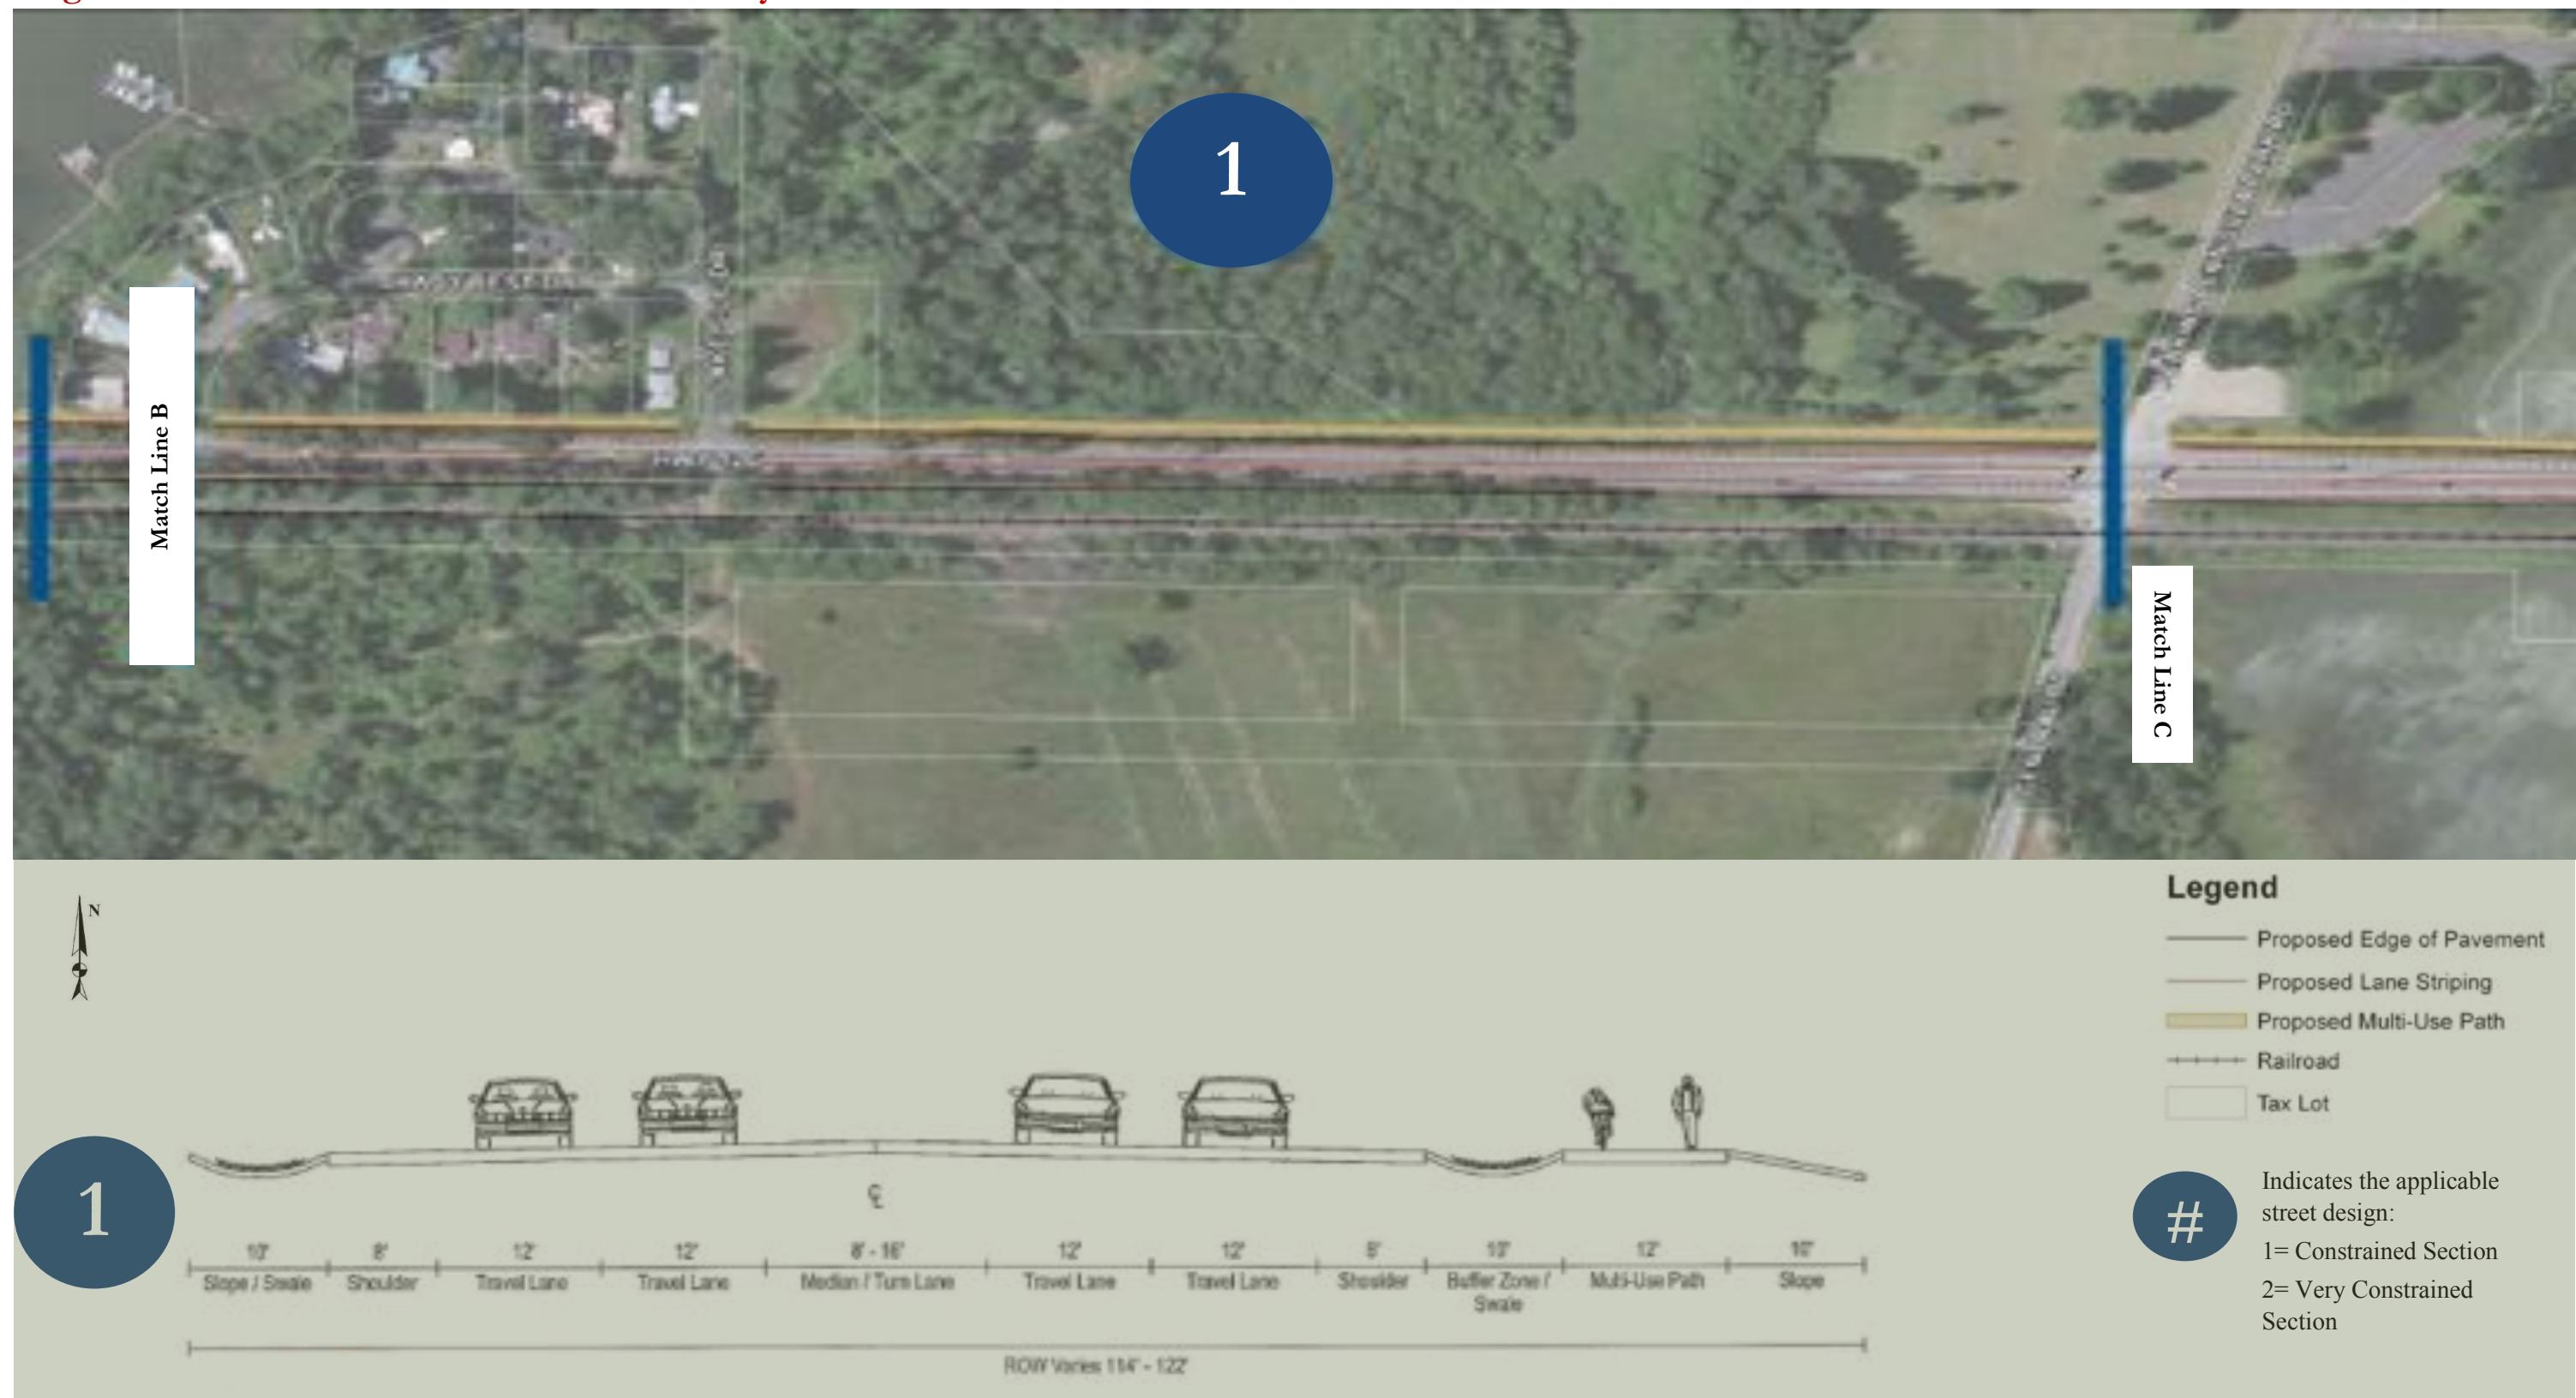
Recommended Corridor Plan: Central Road to Coyote Creek
